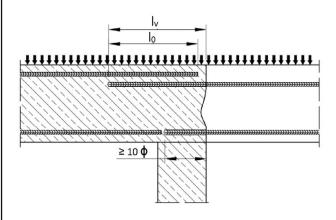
End anchoring of slabs or beams (e.g. designed as simply supported)
